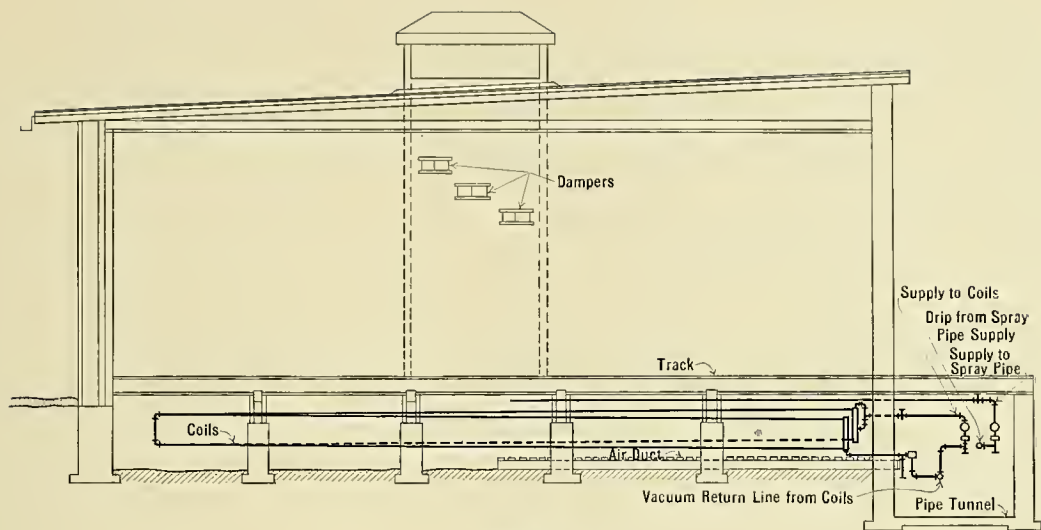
Typical section through a dry kiln using coils of the sectional-header type
